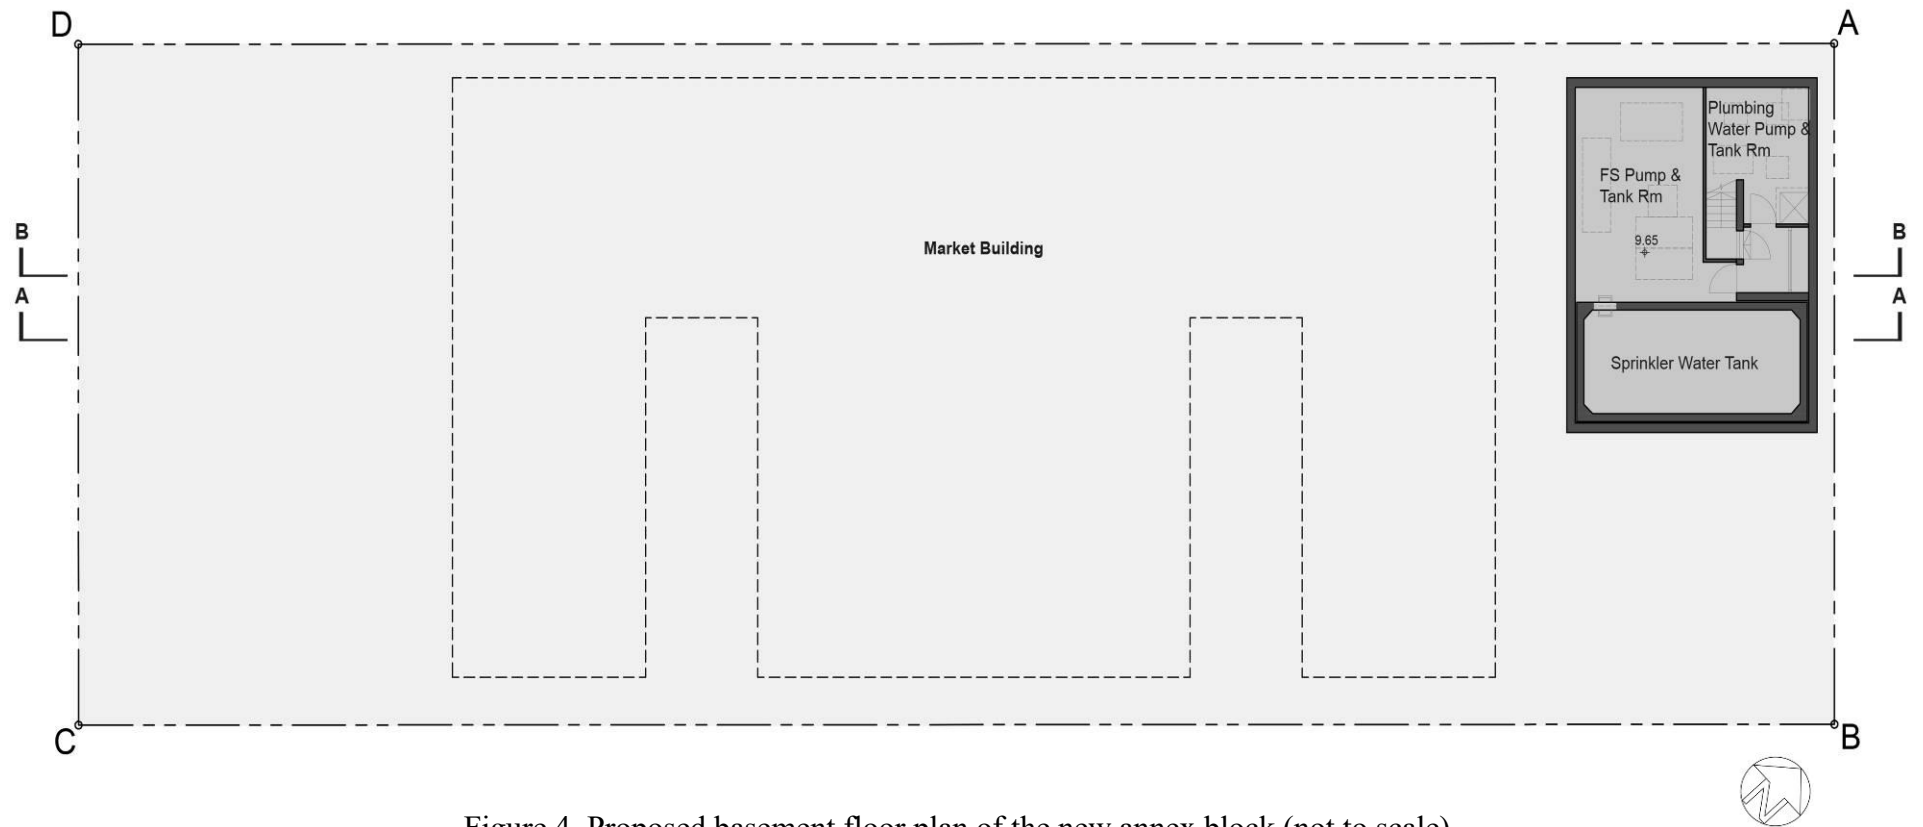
Proposed basement floor plan of the new annex block (not to scale).
